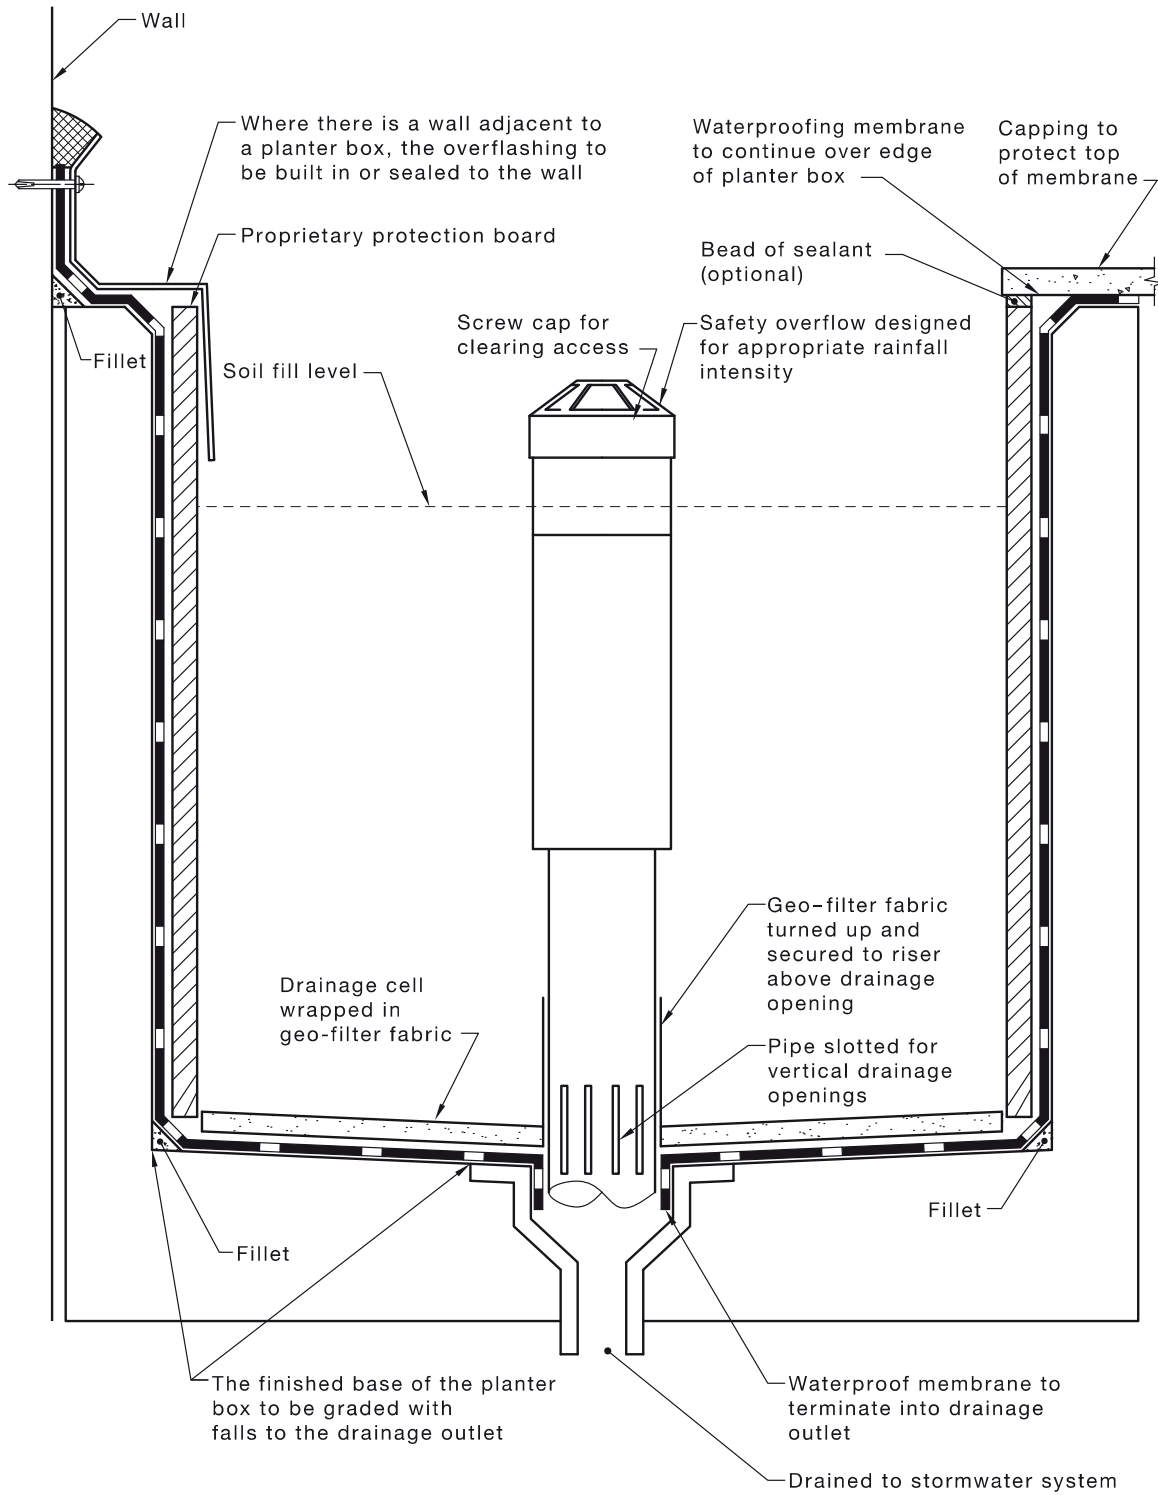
TYPICAL PLANTER BOX CONSTRUCTION
